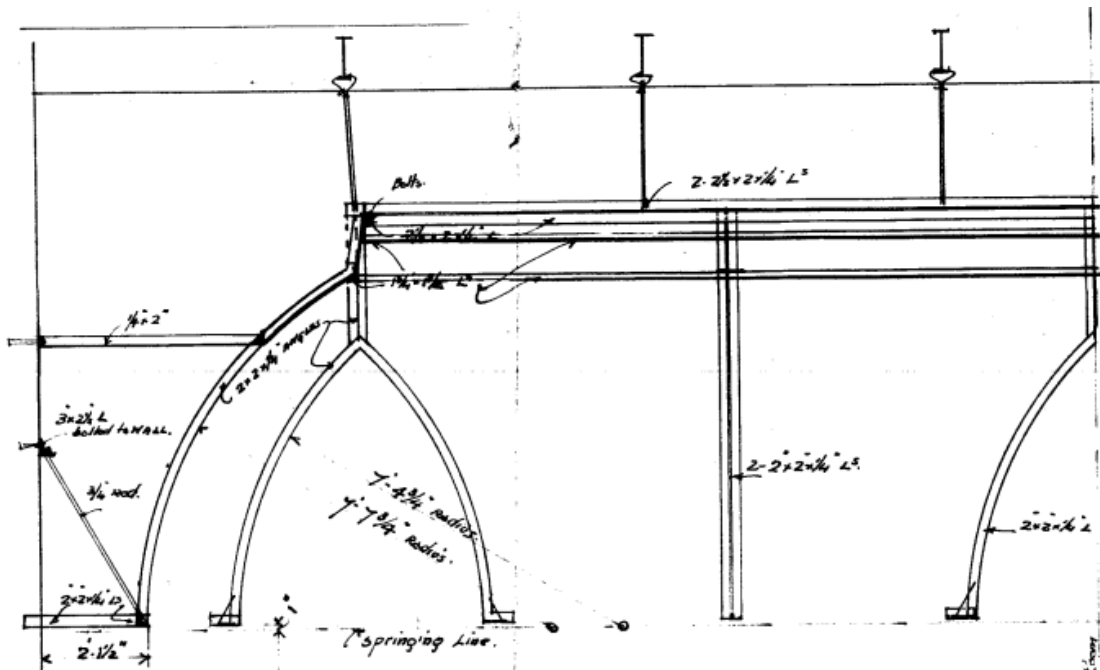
Details of the framing supporting the ceiling at the north end of the Government Caucus Room, including connection into the wall, from original architectural drawing r622 (original drawing number 1149 dated April 18, 1919 by John Pearson Architects)
